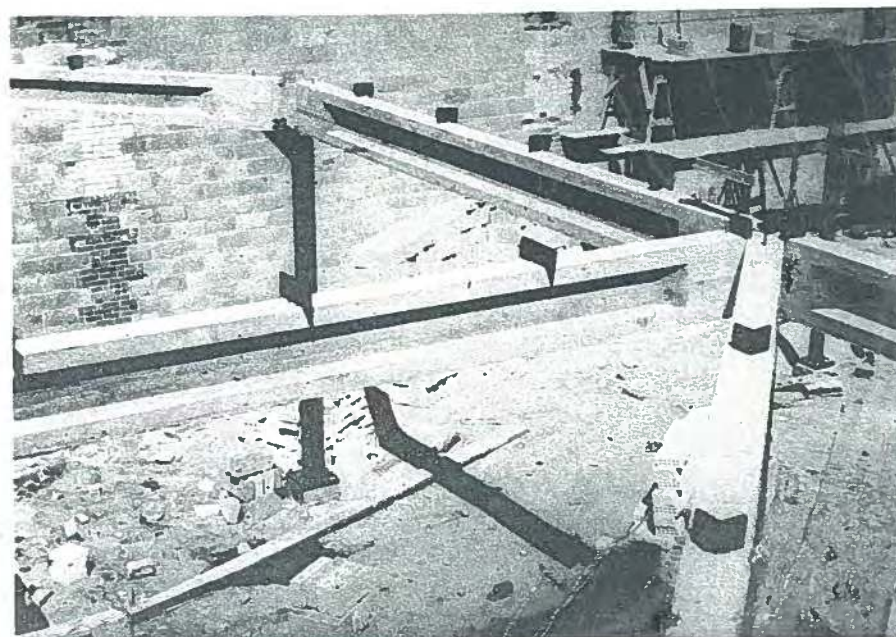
Four beams merge into one column at the Plat Packing Plant.
